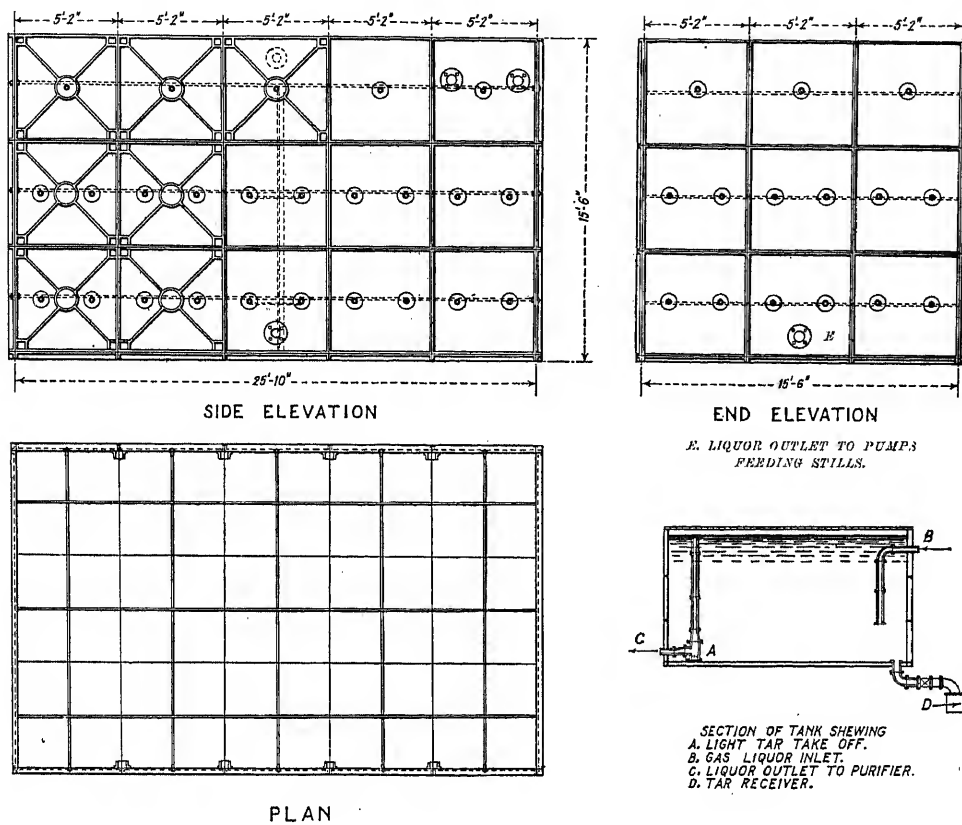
CAST-IRON GAS LIQUOR TANKS, SHOWING DEVICE FOR REMOVAL OF "LIGHT" AND "HEAVY" TAR.
